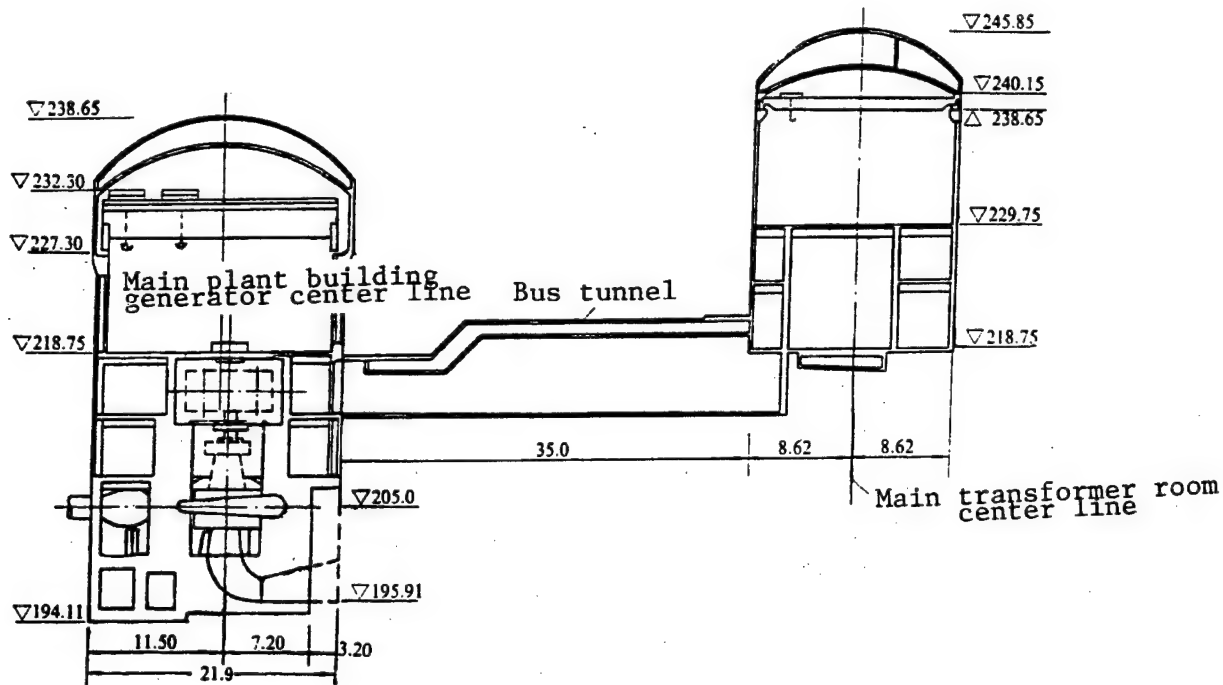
Cross-Section of Main Plant Building and Main Transformer Room
